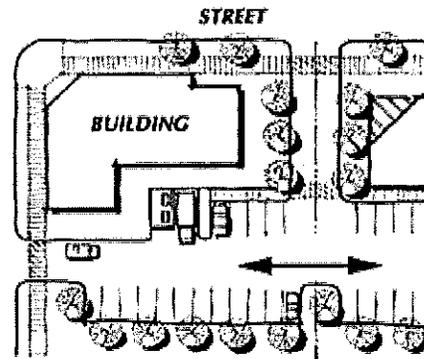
Shared parking and access serve to connect commercial projects
